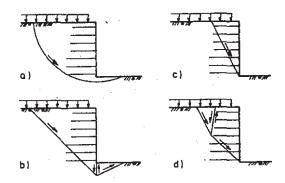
Potential failure mechanisms of nailed walls (adapted from Soil nailing, Stocker, Körber, Gässler & Gudehus, 1979)
